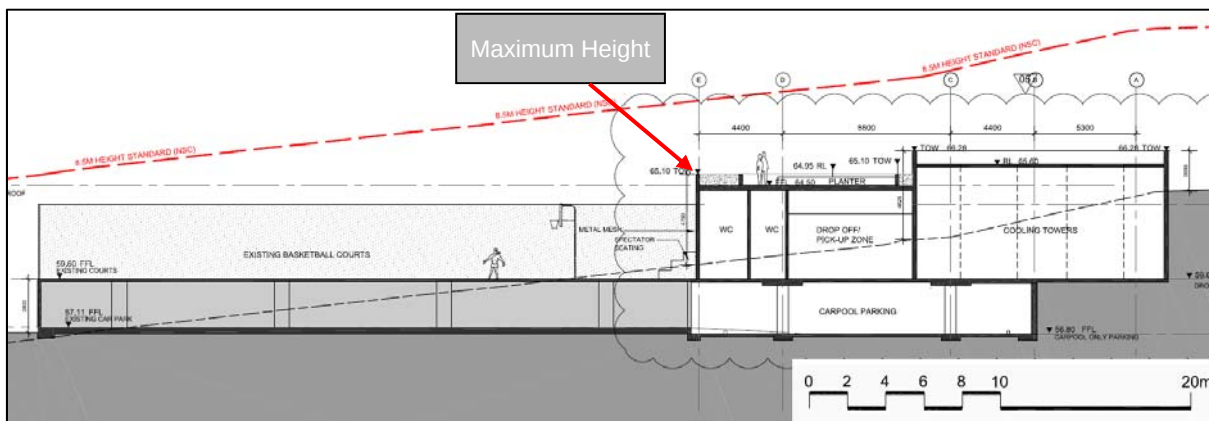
Bishopsgate Carpark proposed north-south section (Source Rts Addendum)
